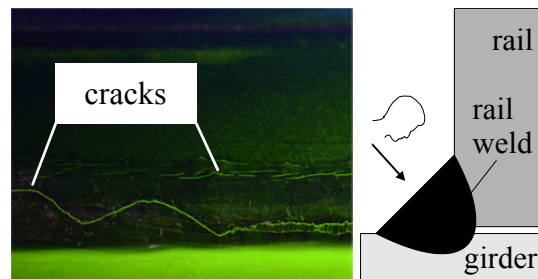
Weld cracks identified by NDT on surface of fillet weld along rail length
